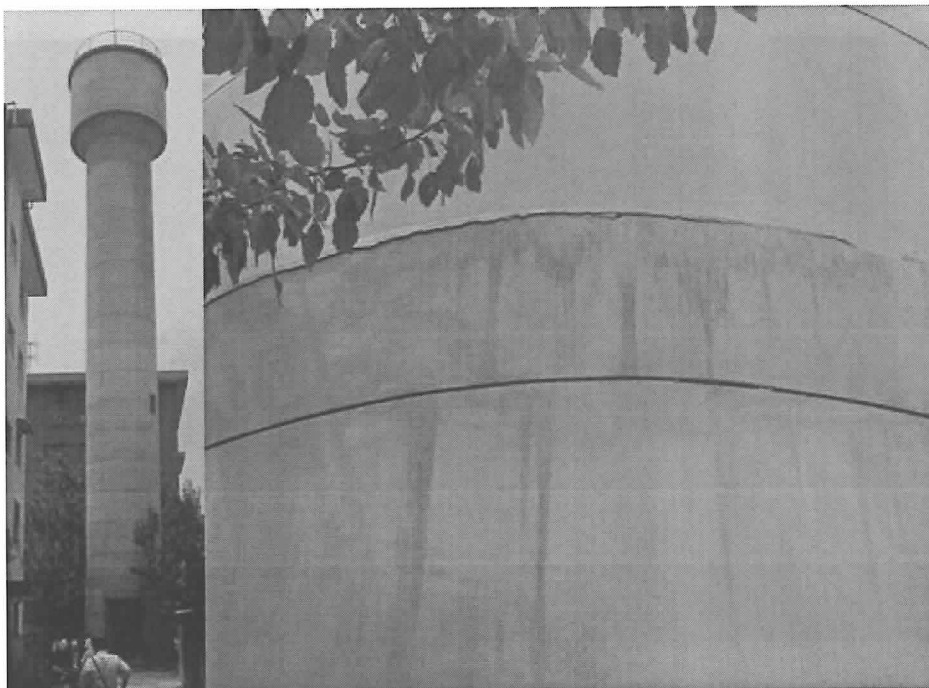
Masonry structure tower is 30 meters high. There is one circular cracks at the site of 6 meter from bottom.
